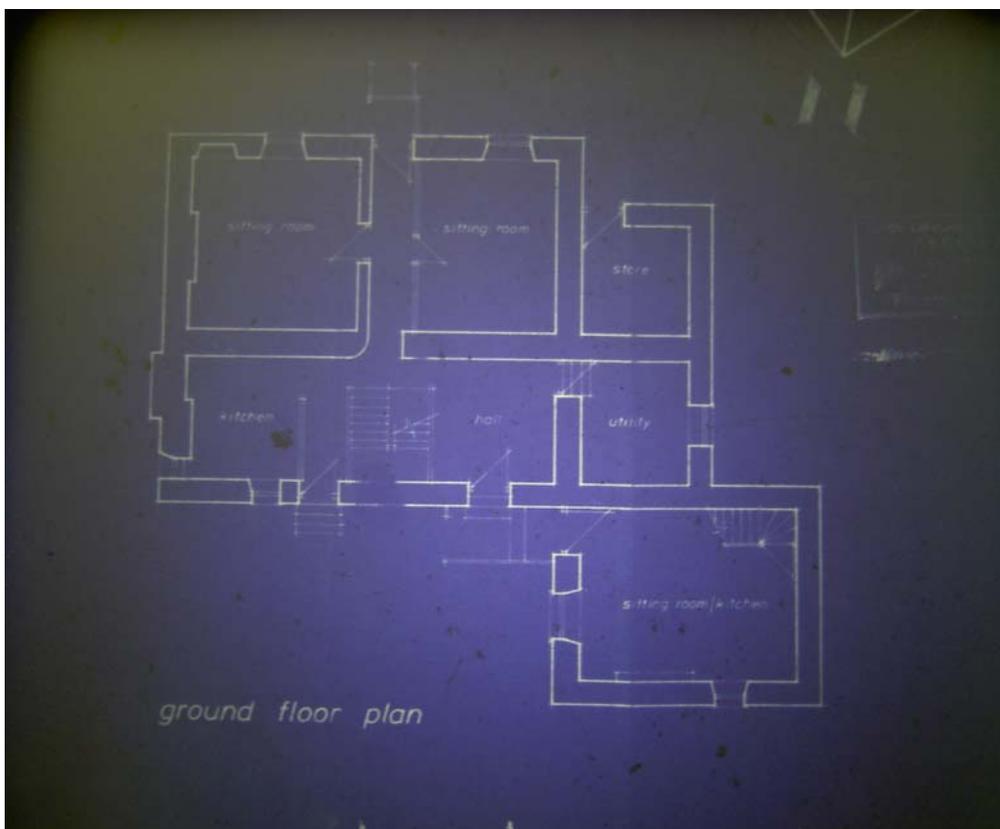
Existing ground floor plan of the house in 1983 (after Anon 1983a)
